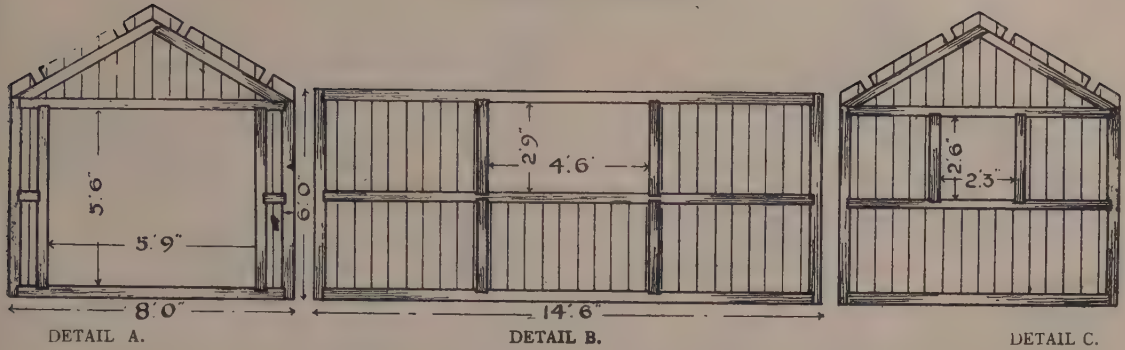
SCALE DRAWINGS OF END AND FRONT FRAMES—A, B AND C.
